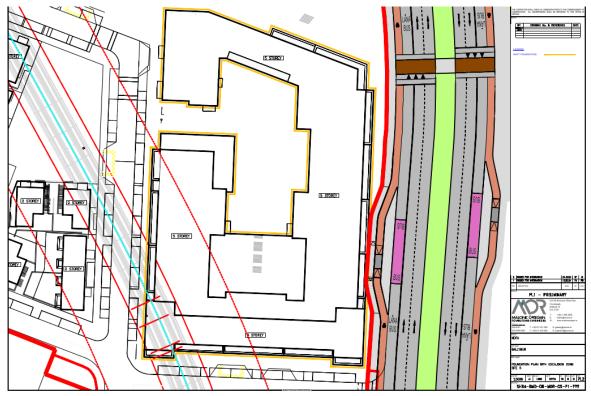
Foundation Plan with Exclusion Zone Site 5
